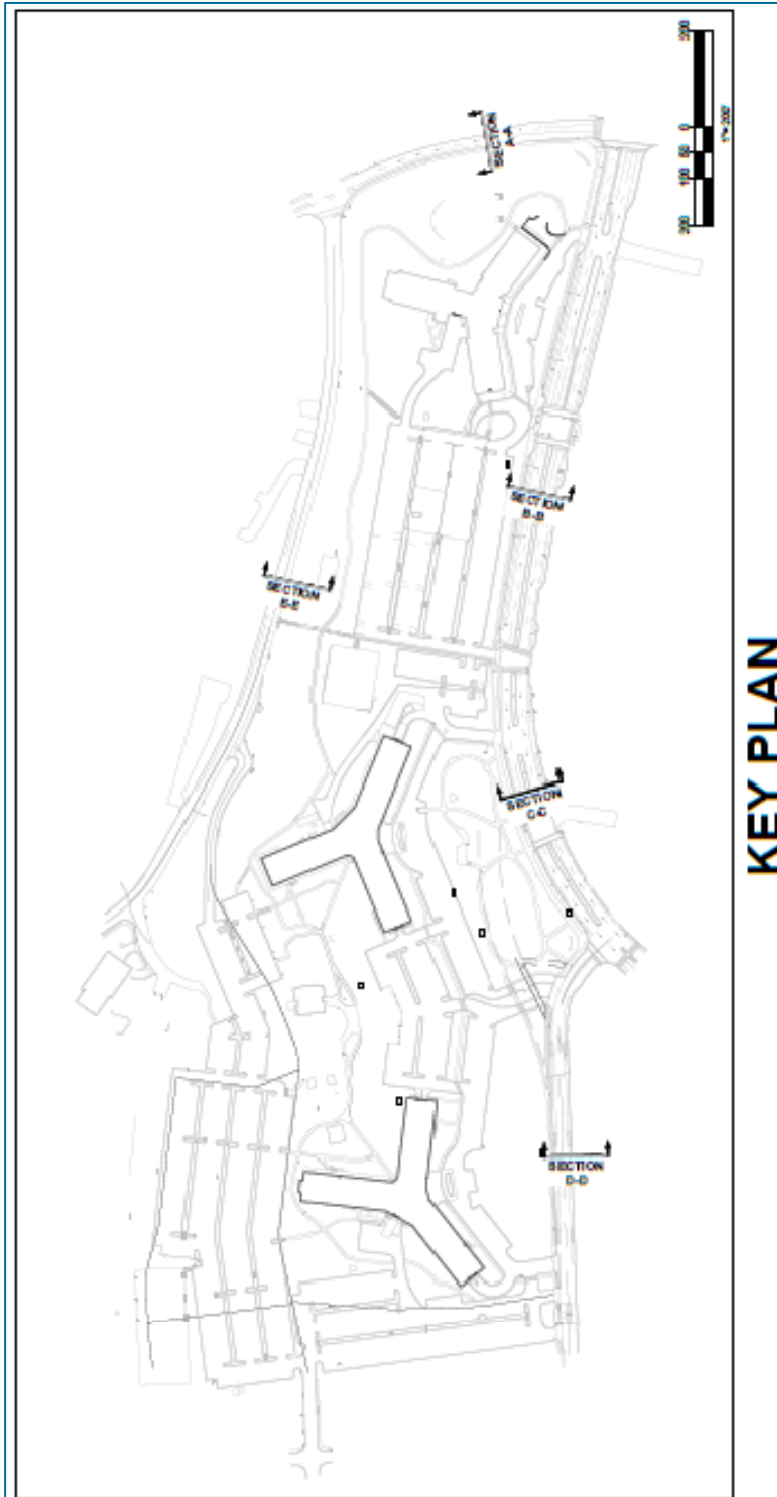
Existing Street Cross-Sections (Source: PDSP Submission, Sheet CIV703)
